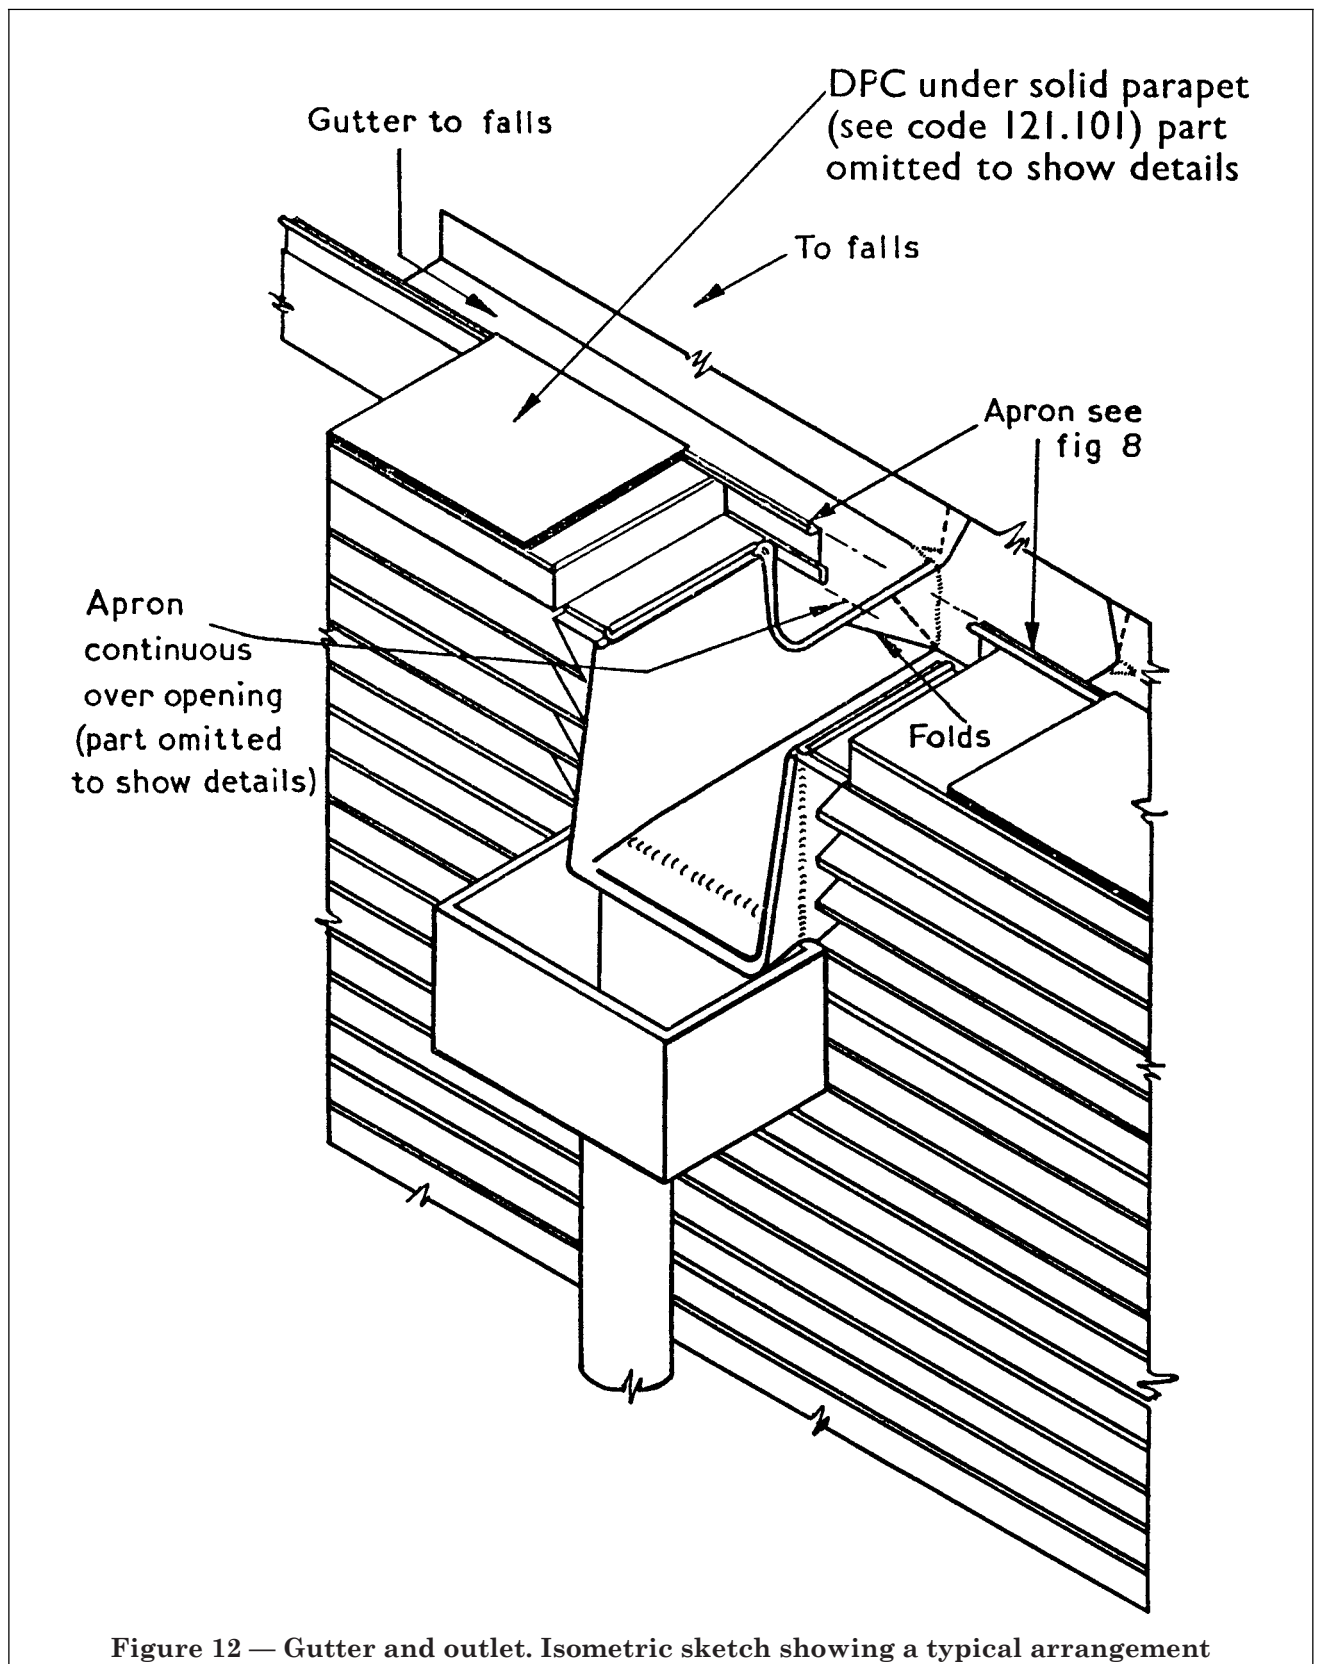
Gutter and outlet. Isometric sketch showing a typical arrangement
